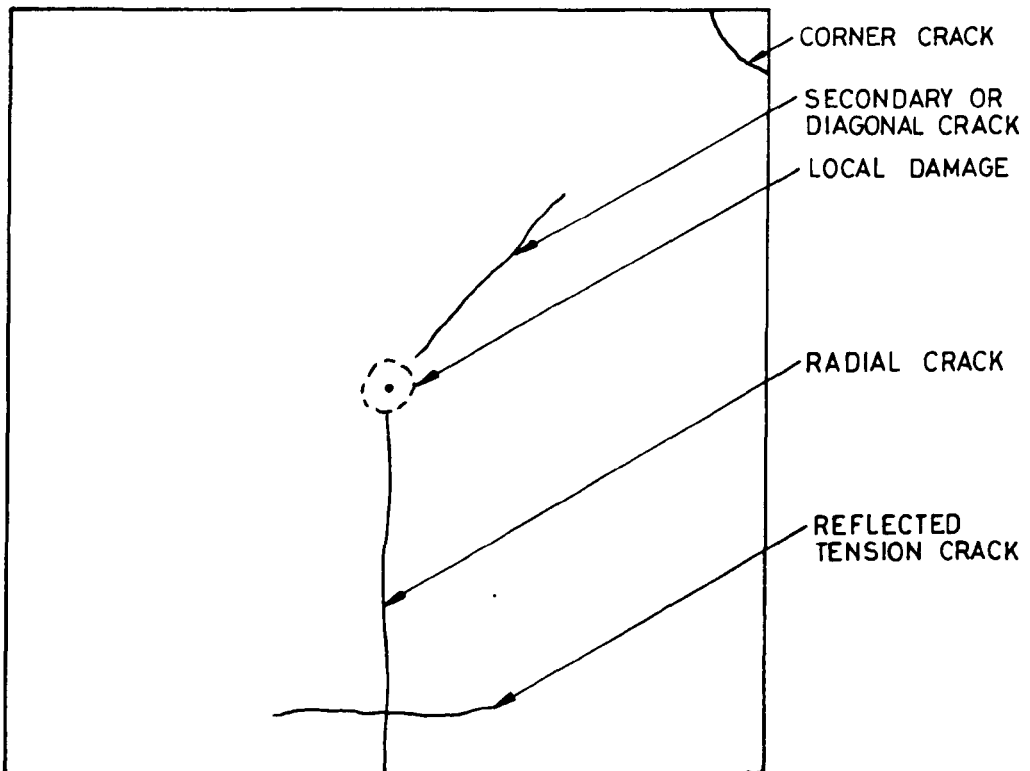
DEFINITION OF CRACKS FORMED IN CONCRETE SLABS BY SHAPED CHARGE JET IMPACTS
